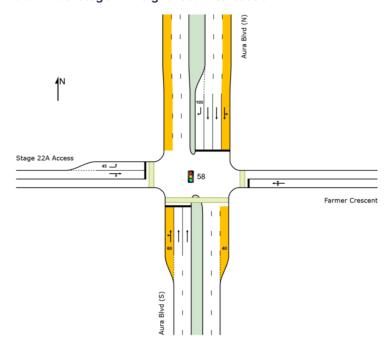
Aura Blvd & Stage 22A Access Intersection SIDRA Layout (SMEC 16/04/2024)
